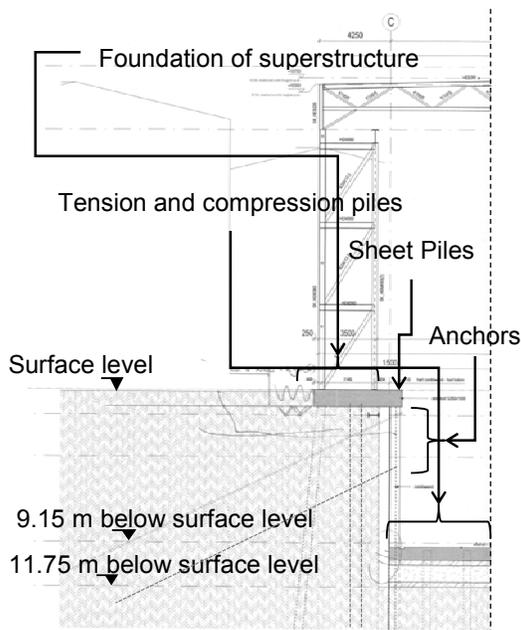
Cross section at the landside of the dry dock, with superstructure, foundation elements and underwater concrete.
